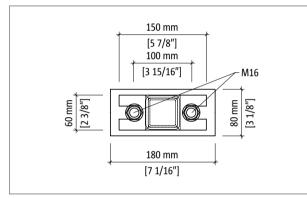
Schöck Isokorb® T Type S-V-D16: Elevation of the product
